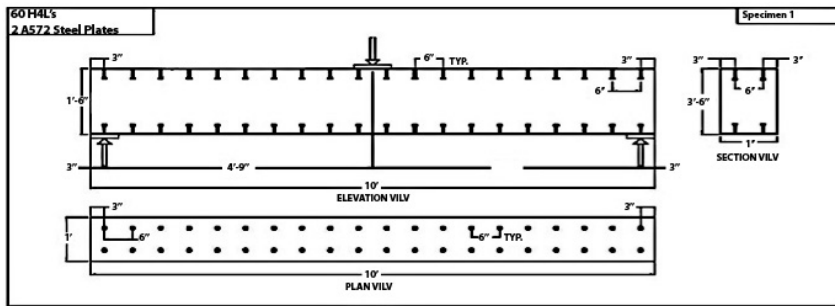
Specimen geometry and concrete crack map for SP1-5 [9]
